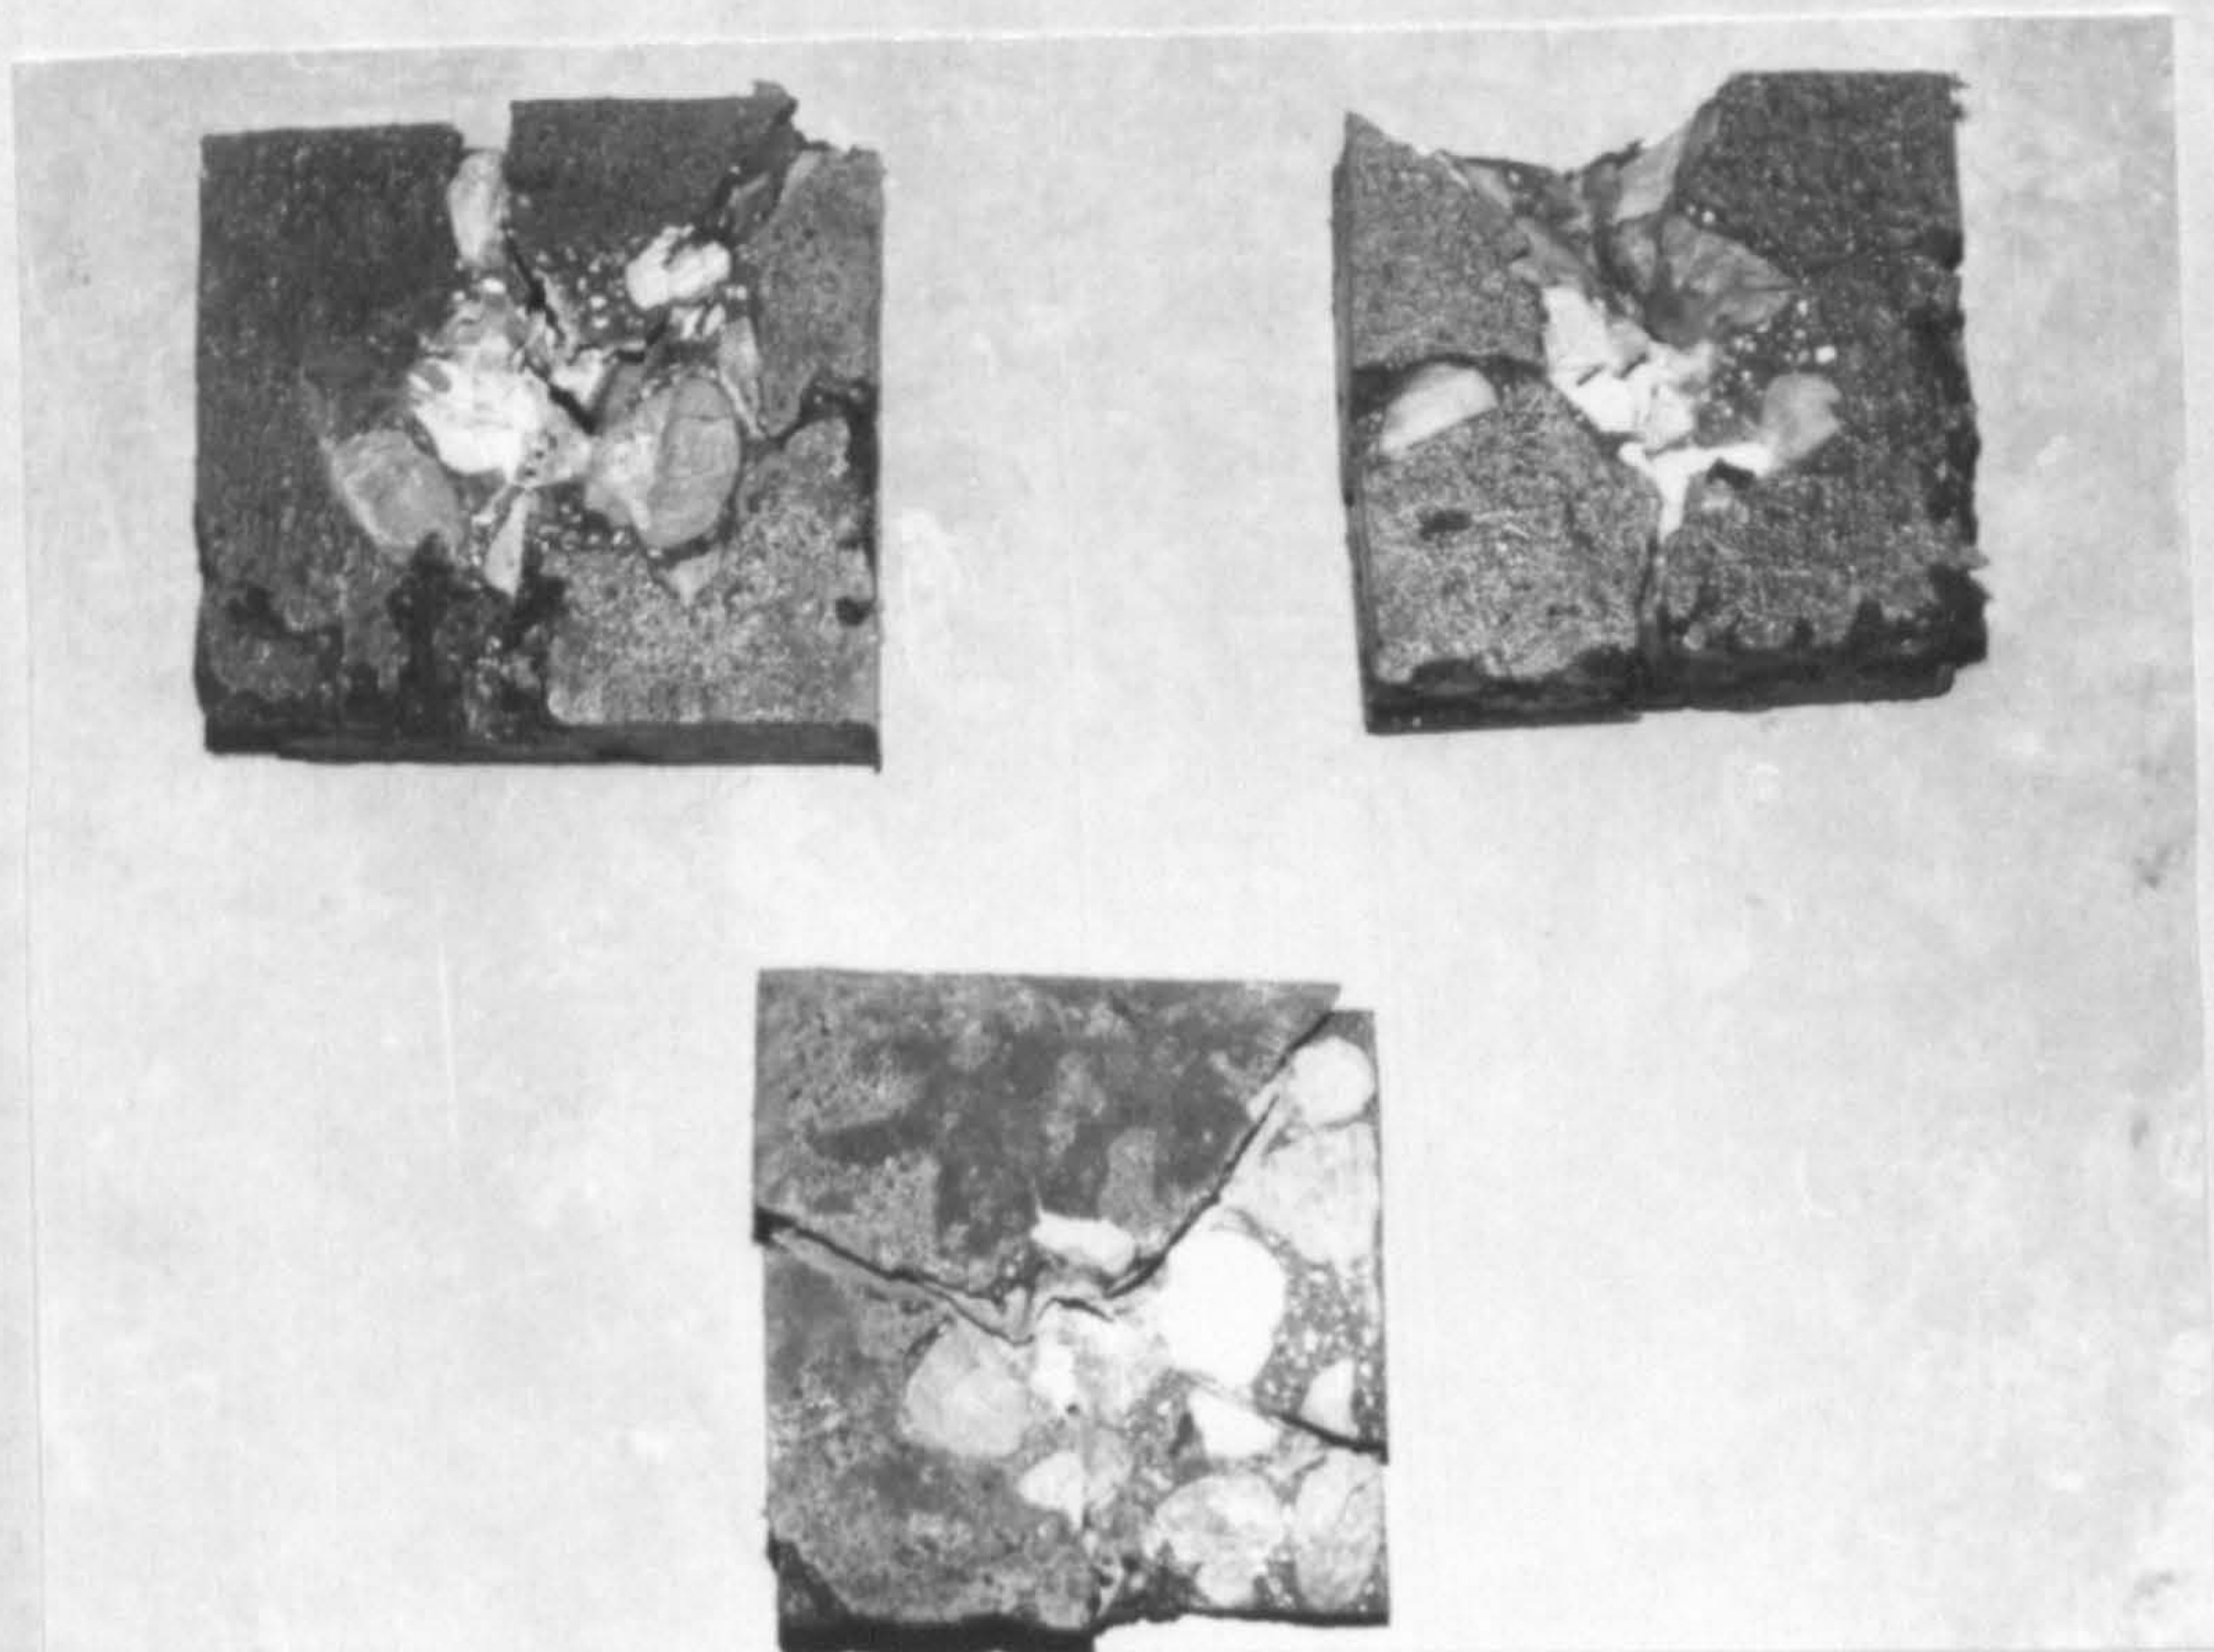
TYPICAL IMPACT FACE DAMAGE FOR COLD SPECIMENS, SERIES 22
